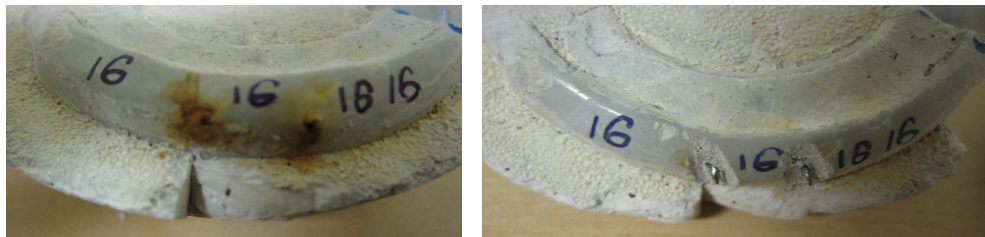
Corrosion of the steel sensing wire did not penetrate into the epoxy housing (Sensor J016).
